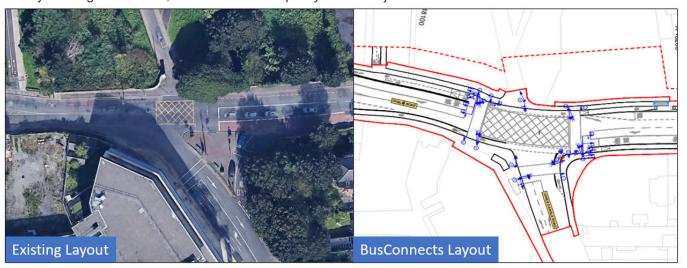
Existing and Proposed BusConnects Southern Access Junction Layout
